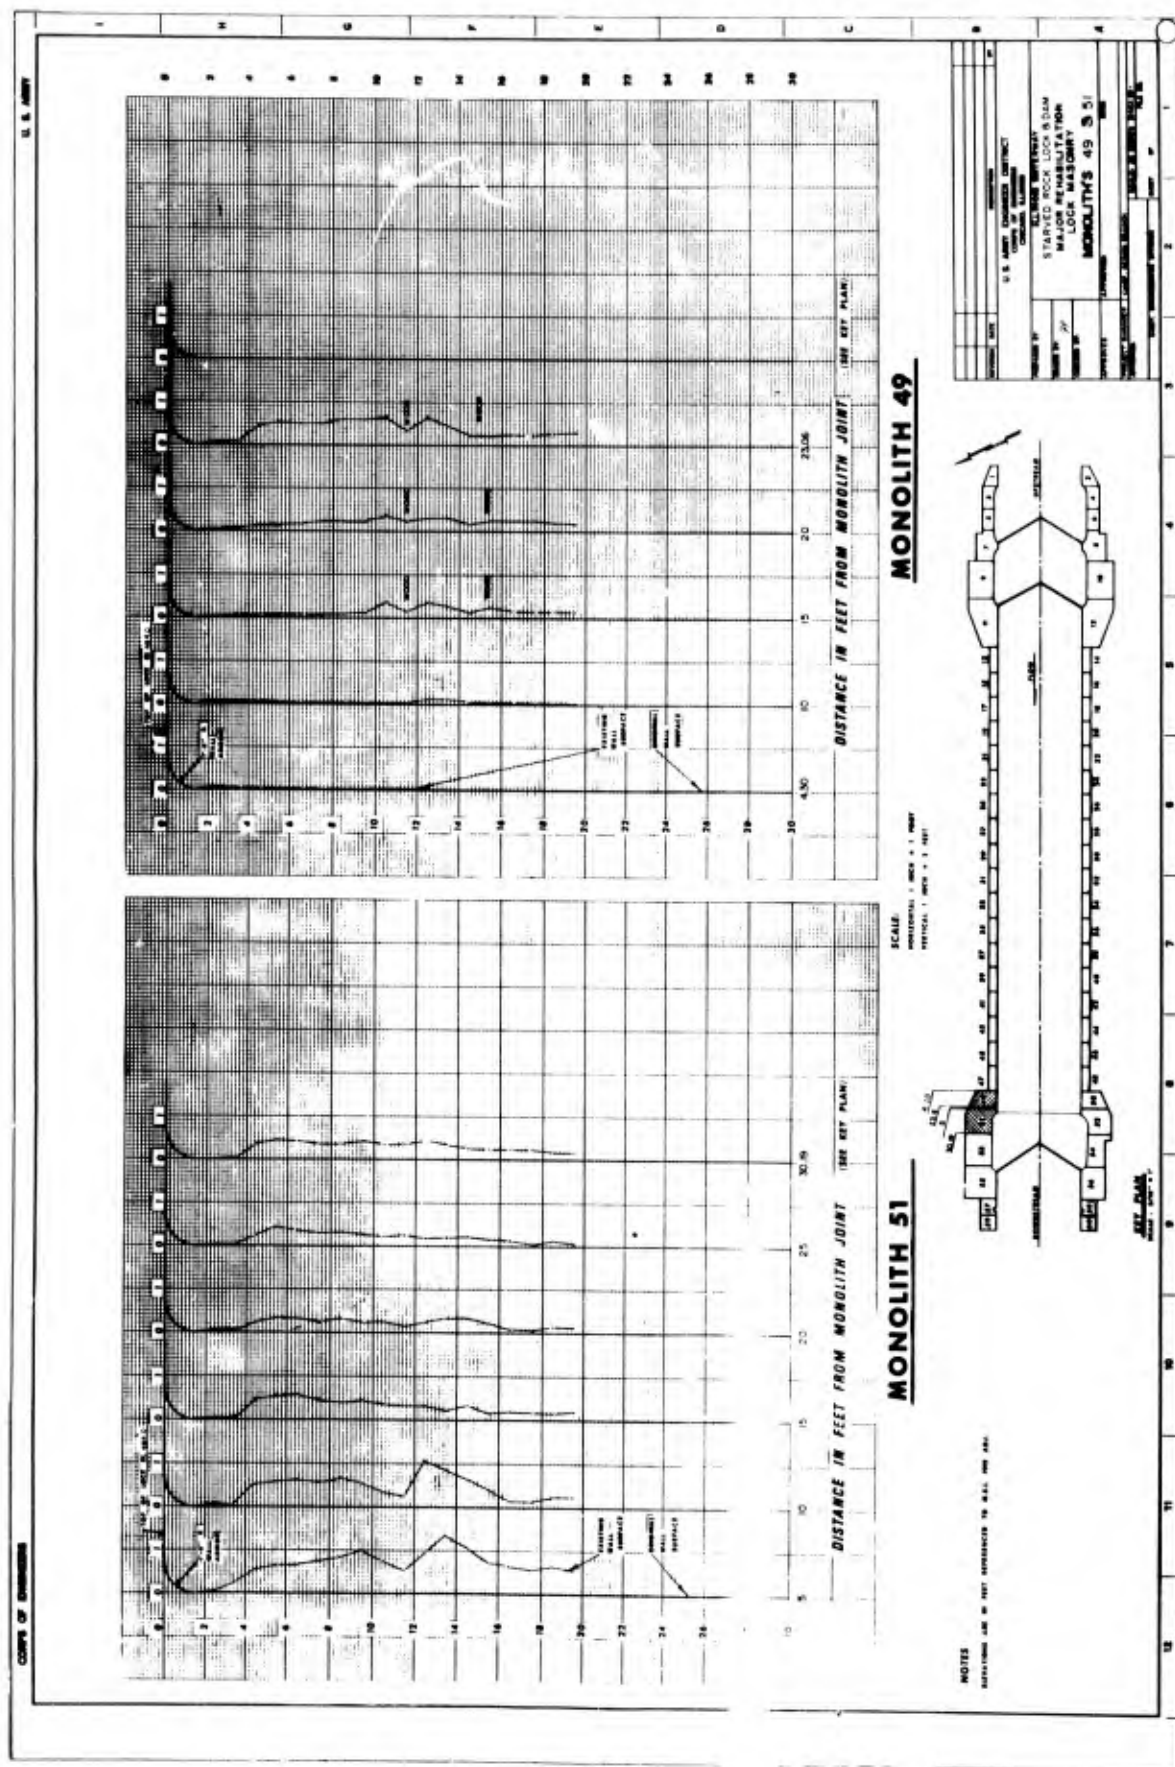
Lock wall profile indicating loss of concrete on lock wall
